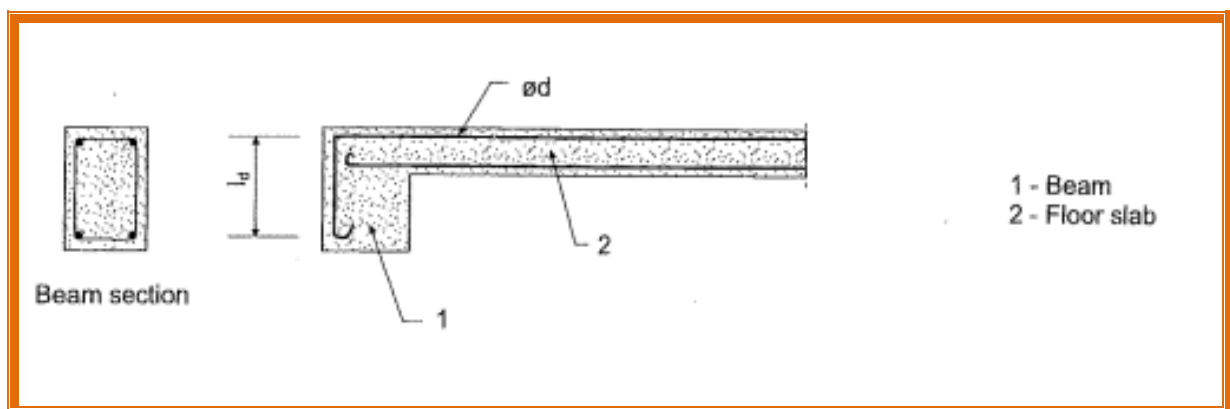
Connection between floor slab and beam (Kaikan K. (2001)).
